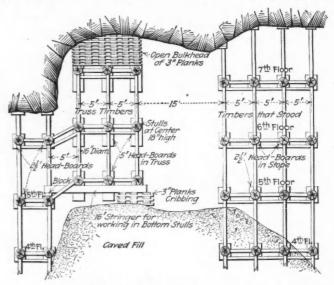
AT THE TOP OF THE CAVED FILL THE TRUSS-WORK OF SPLICED STULLS IS SUPPORTED ON CRIBBED PLANK, WHICH ALSO CATCH UP THE BACK ALONG THE TRUSS RIDGE
